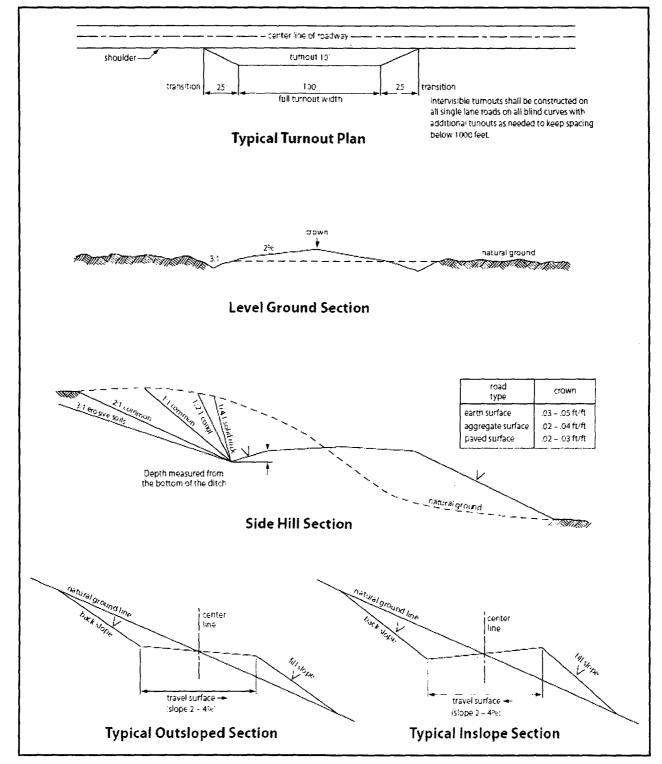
Cross-sections and plans for typical road sections representative of BLM resource or FS local and higher-class roads.
